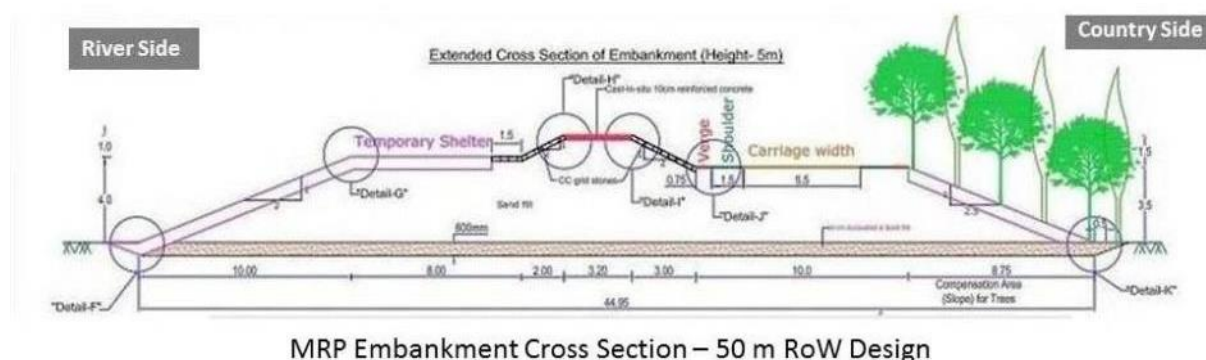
FERMIP 50 m RoW Embankment Cross Section
